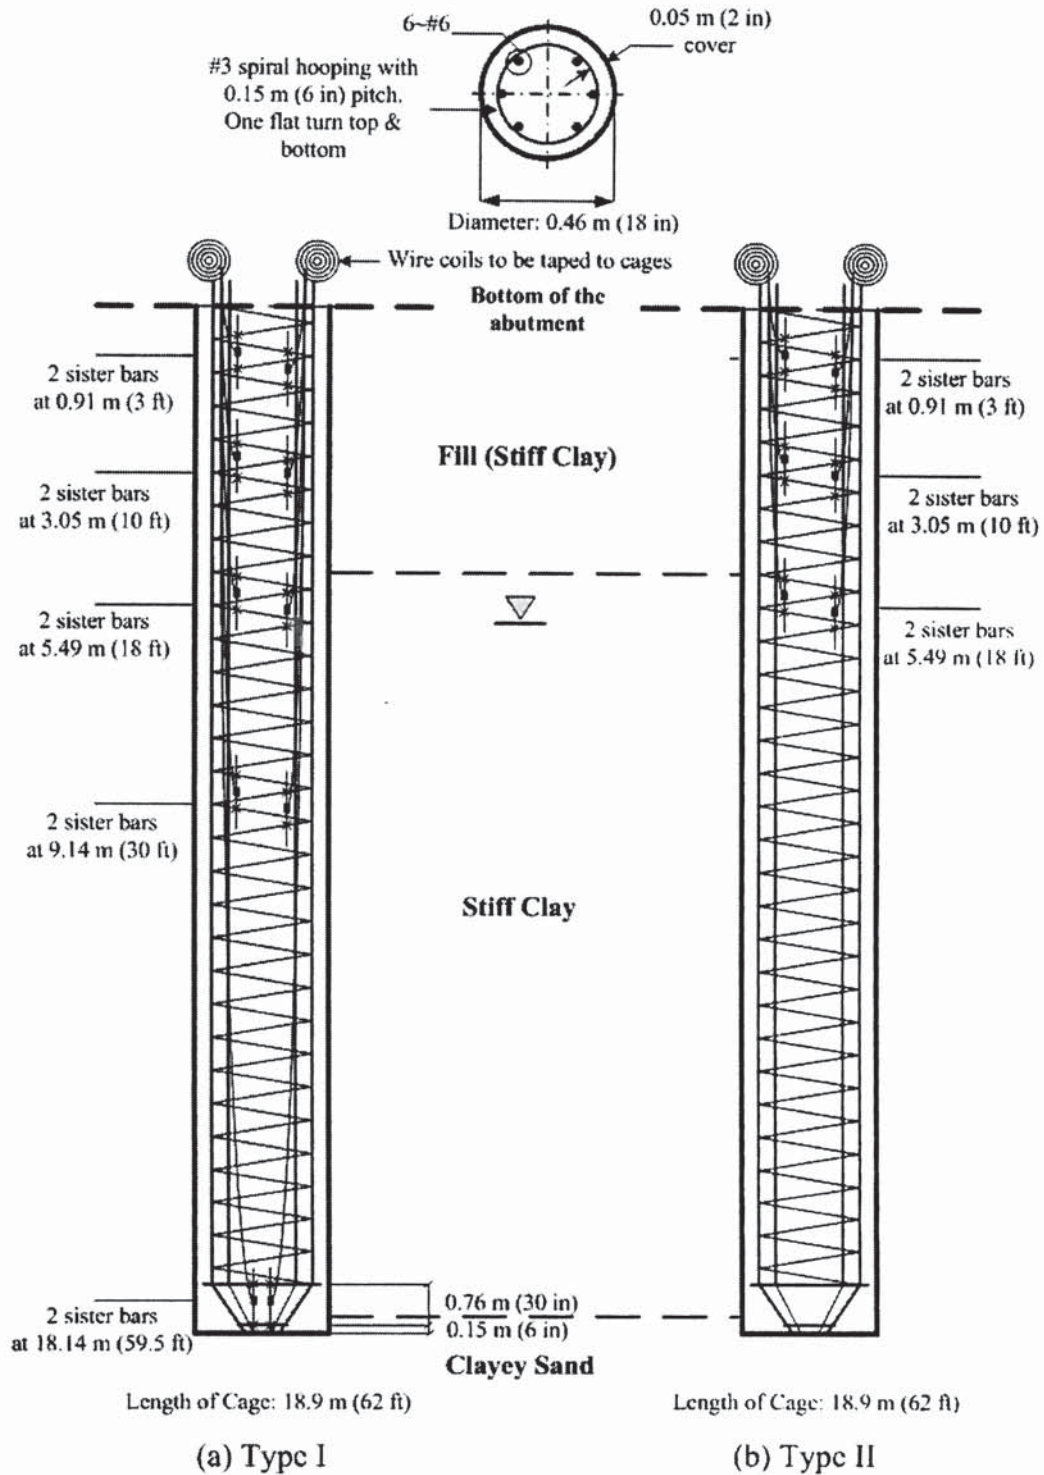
Instrumentation Details for Central Bent Piles:
